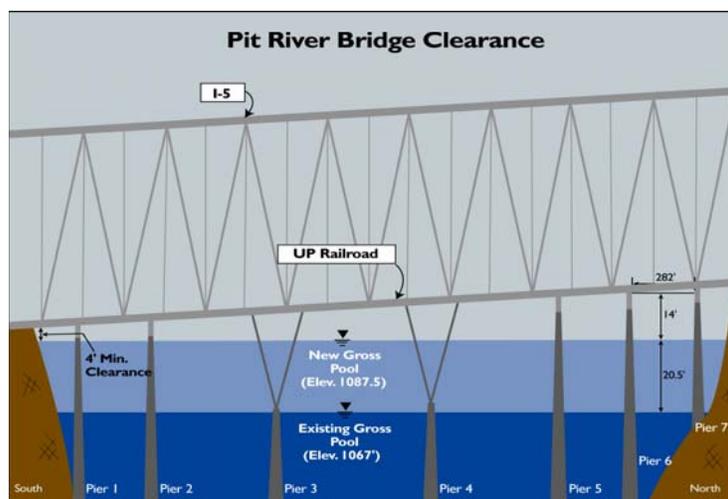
Minimum clearances for boat traffic at Pit River Bridge, gross pool with 18.5-foot dam.
